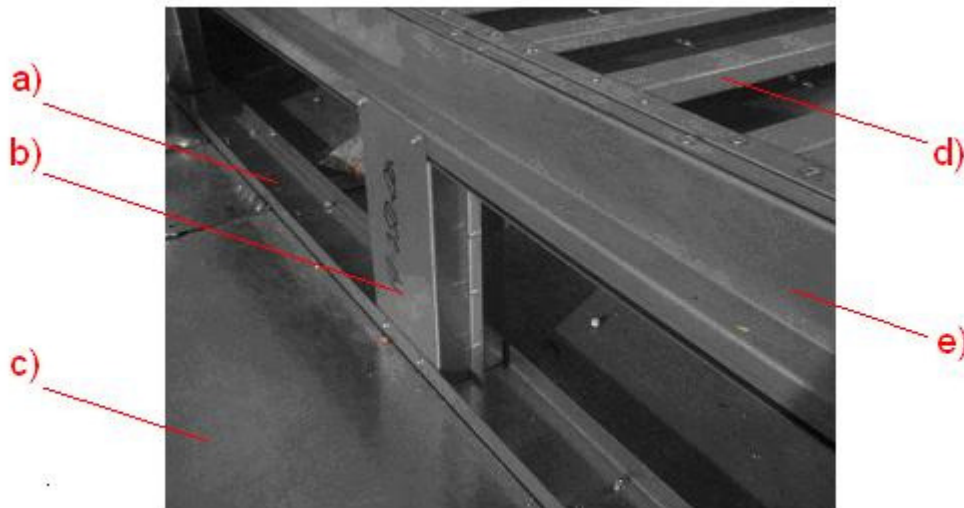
Floor plenum assembly: a) u-channel b) plenum post c) floor insulation d) grating e) saddle rail
